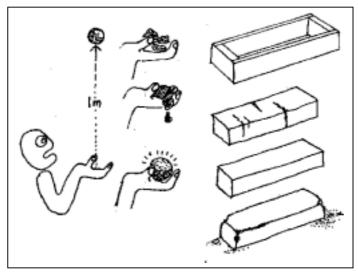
; Fig. 7-12: Test block mold. Note slightly sloped sides; Fig. 7-13
